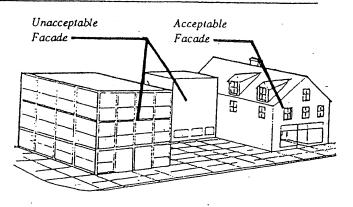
Facade Fenestration Standards showing recommended use of glass on street facades. The set-back building would be acceptable if the area in front of the building were used for a public purpose such as a seating area, outdoor cafe, etc. with the facade line reinforced with tree planting.
